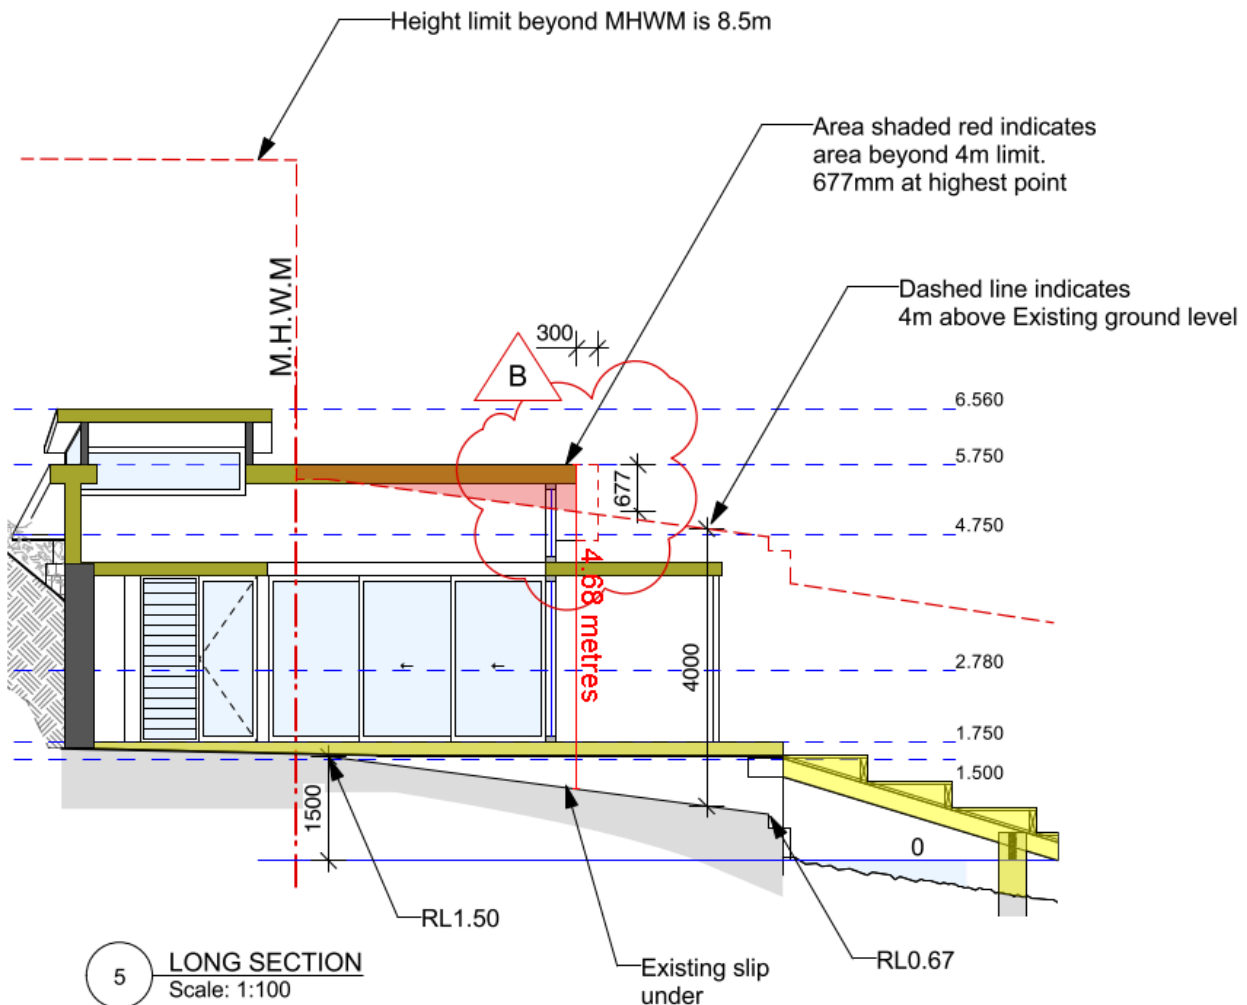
Long Section of the proposed boatshed with the portion of the roof breaching the height of buildings development standard in red.
